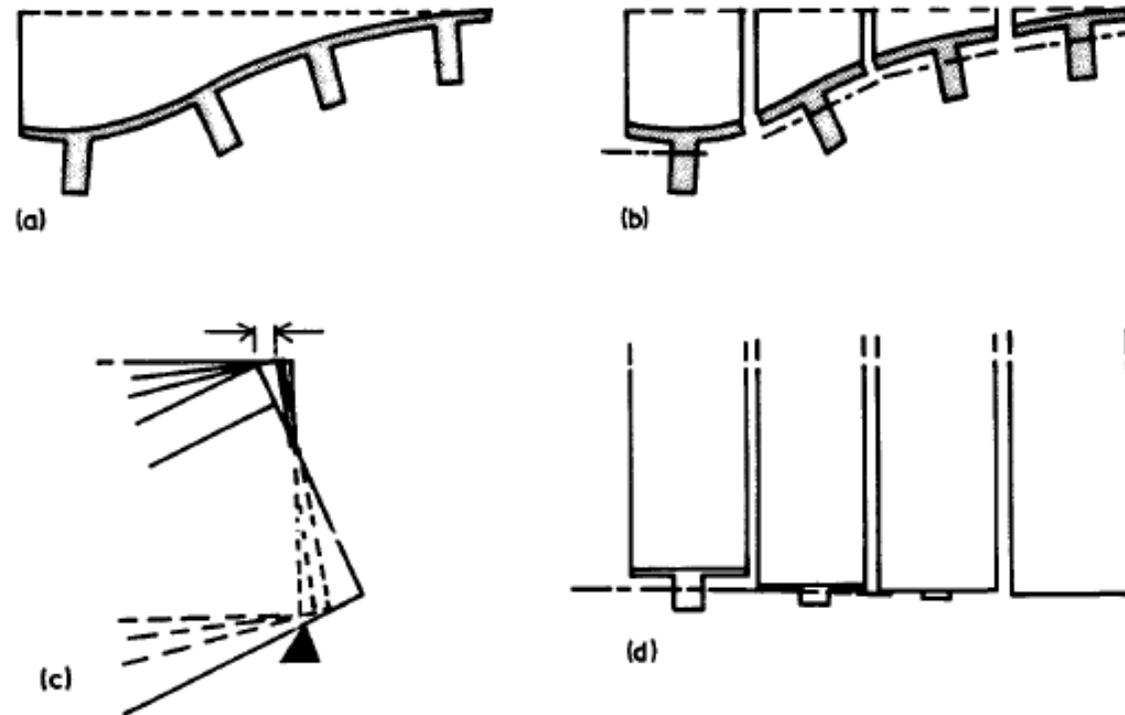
Effects of slab membrane action in beam-and-slab deck: (a) in-plane shear in slab; (b) axial force in beam; and (c) movement of neutral axis.
